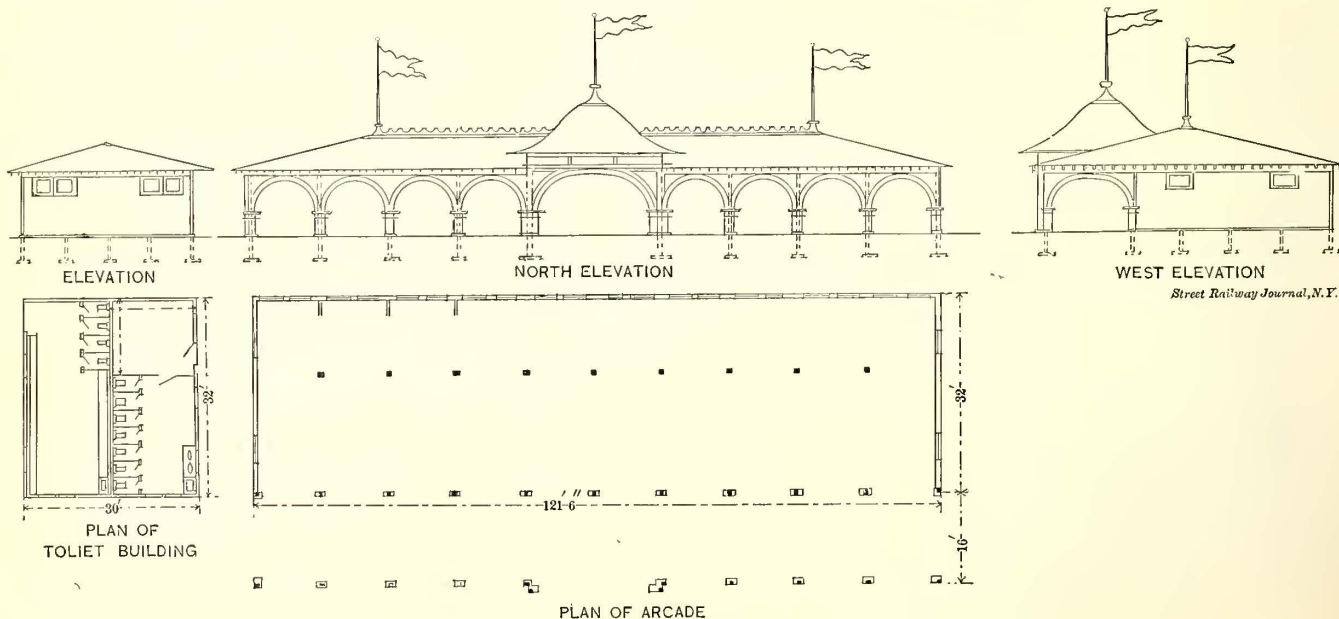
PLAN AND ELEVATIONS OF ARCADE
